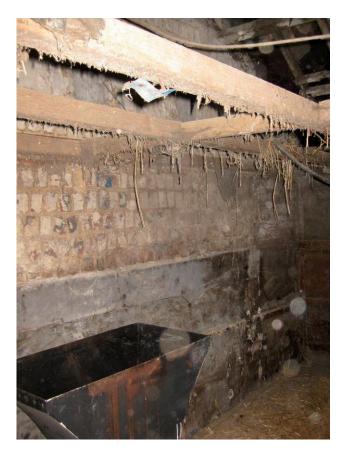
Interior of westerly room of east-west range of animal accommodation, showing brick coursing of wall, looking southeast
